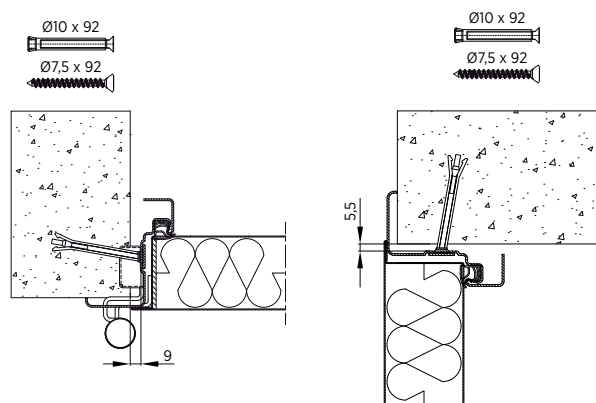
Installation of the embracing frame, single-leaf door sides and lintel
